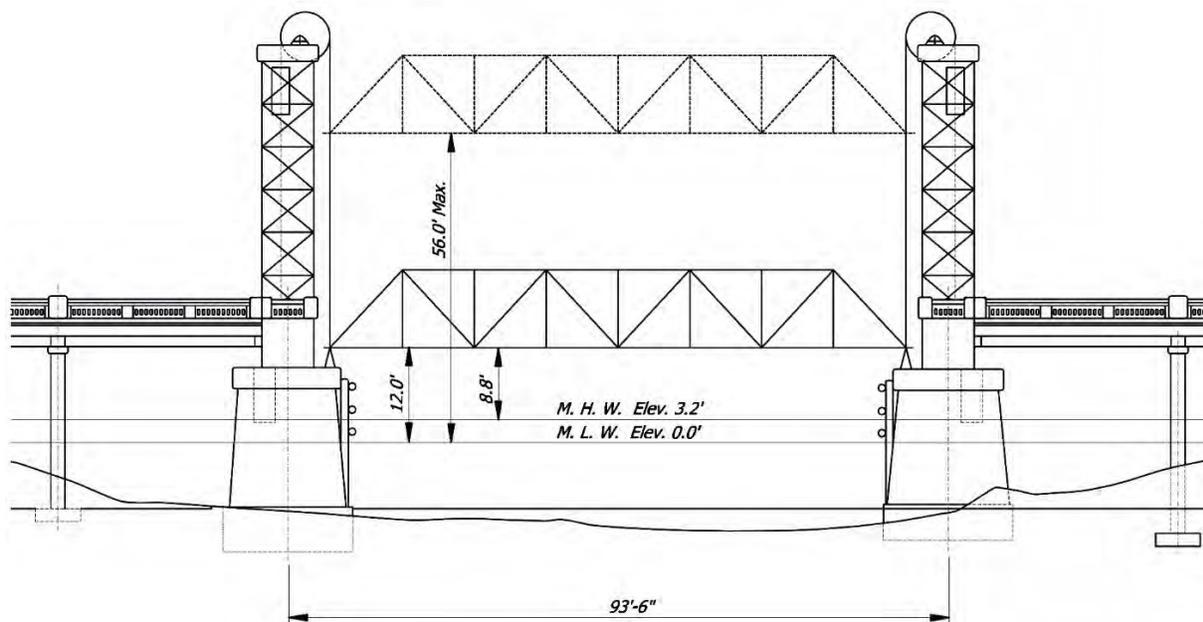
Bridge elevation view for a vertical lift bridge indicating vertical clearances. (Source: Florida DOT)
